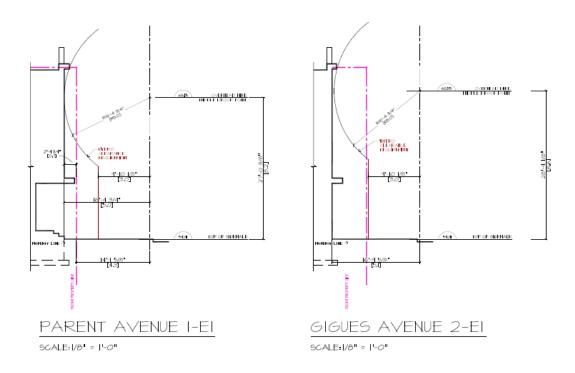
Section through the building showing hydro setback . Source: Hamel Design August 2019
